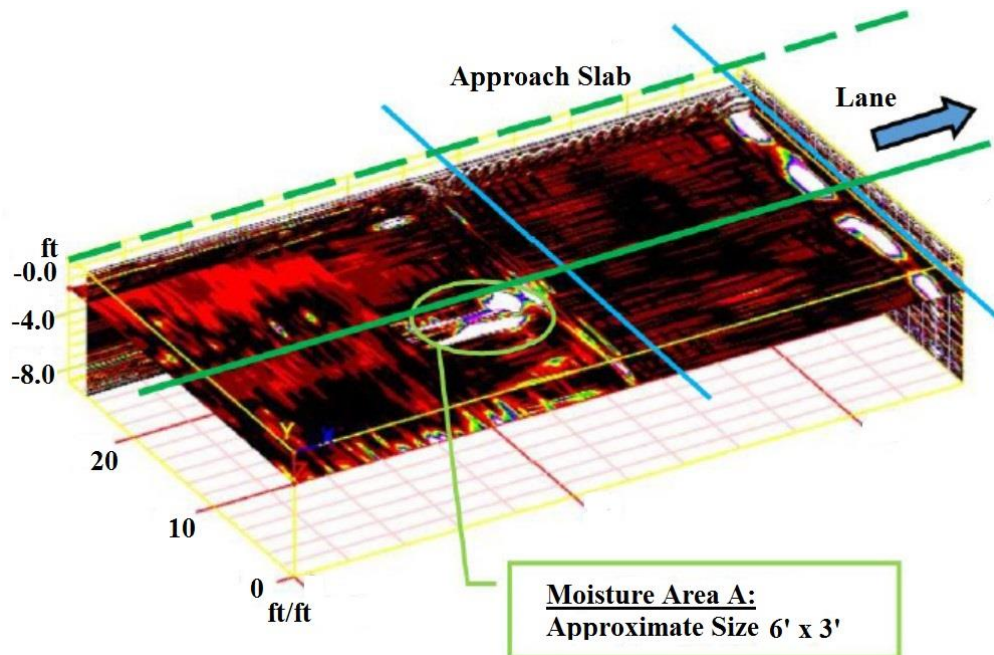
An example of GPR survey for bridge approach pavement (Bridge: 910097)
